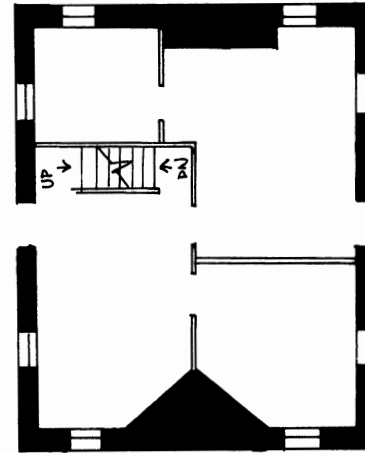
John Poage House Plan, original four room plan shown. Later addition creating hall off front door is omitted.
